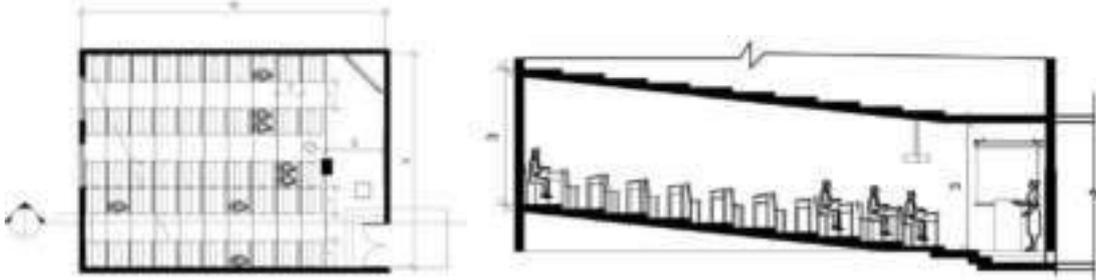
Plan and Section of Classroom Case 1 Junior college (Source:- Author)
